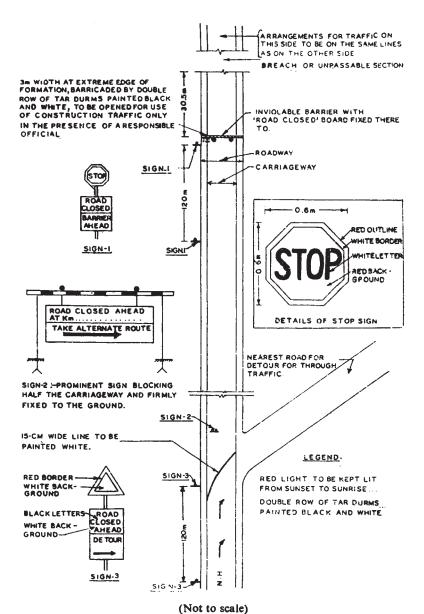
Arrangements for traffic when a section of N.H. is to be closed due to breach or damage
